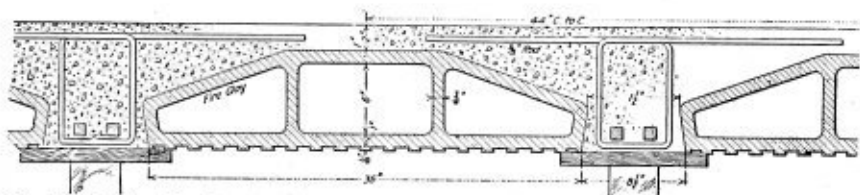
Section Showing Details of "Barry" System of Concrete and Hollow-Tile Floor Construction.
